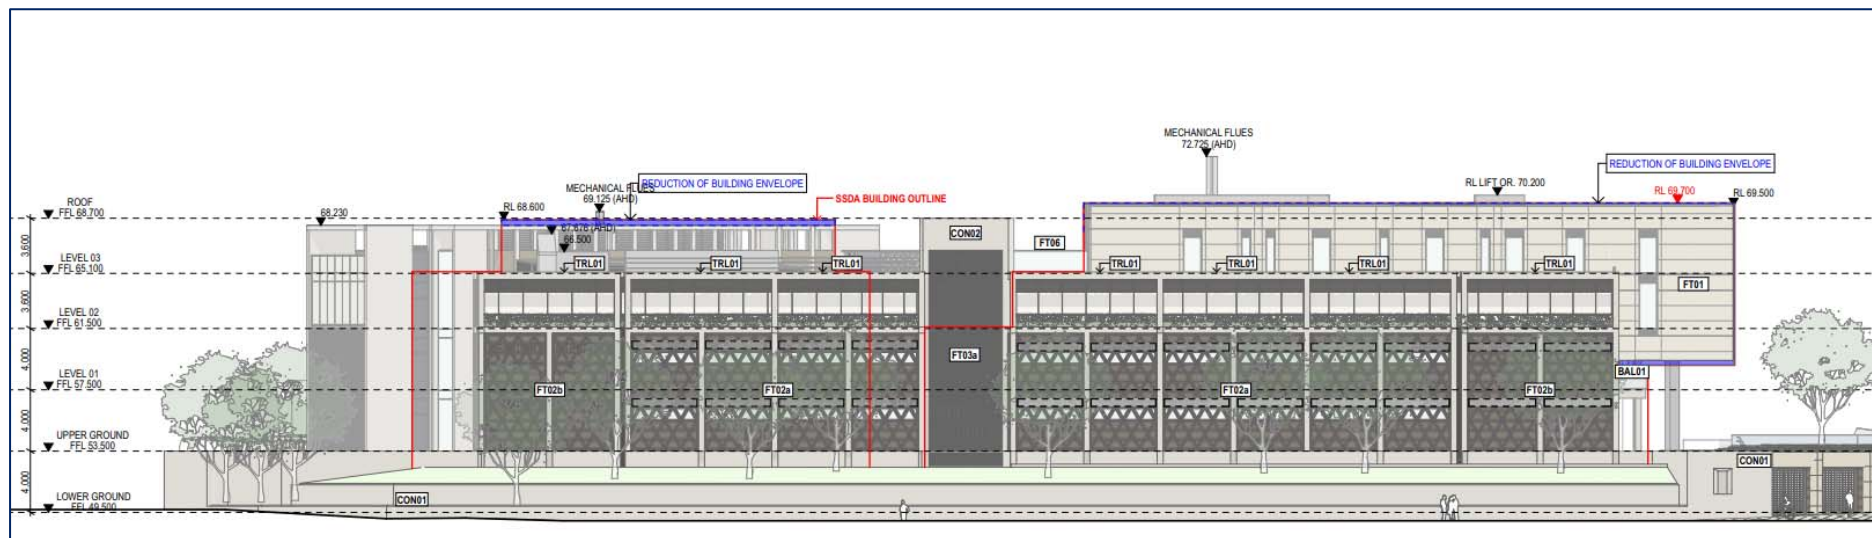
| Eastern elevation – Stages 1A and 1B complete (Source: Applicant's SRtS)
